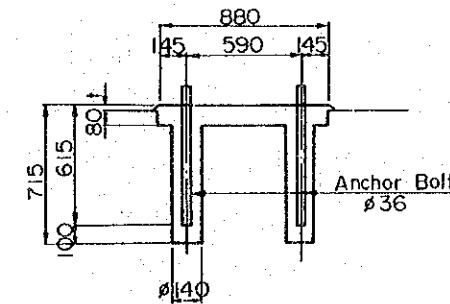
Primary Dimension of Substructure and Foundation (A2-1/2)
